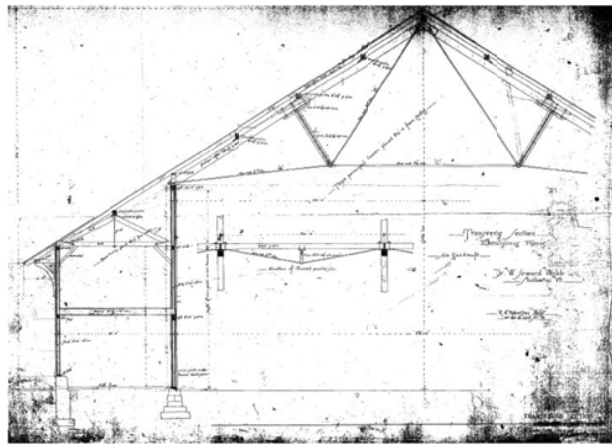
Robertson’s transverse section of the riding ring, showing the composite truss, trussed purlins, and aisle framing. Note the tapered scarf in each top chord member, located over the struts.
